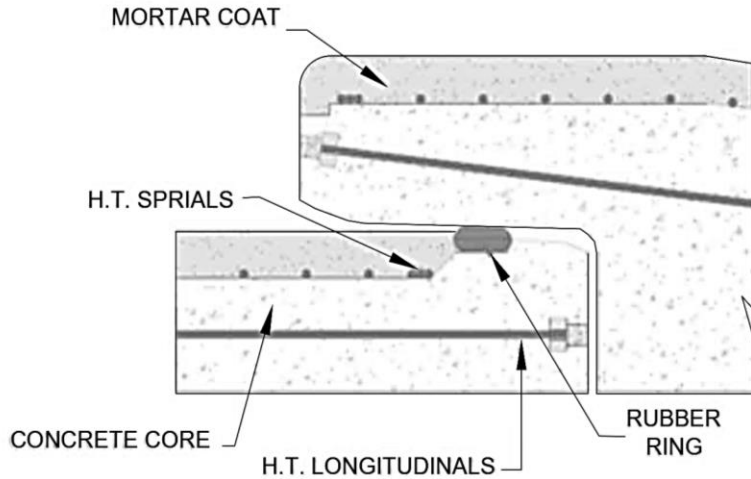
PSC (Non-Cylinder Type) Pipe Confined Joint Details
